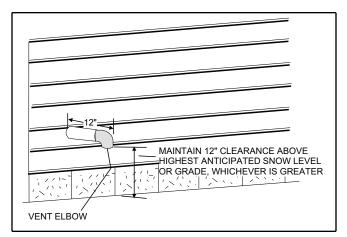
Horizontal Termination Configuration with 12" Minimum Clearance
